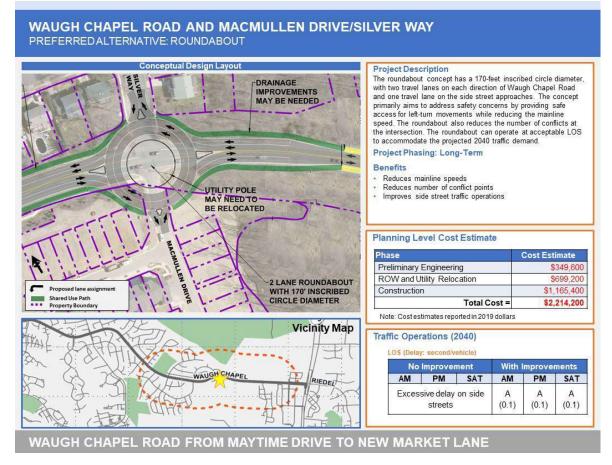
Project Summery for the Preferred Alternative (Roundabout) at Macmullen Drive/Waugh Chapel Road Intersection
